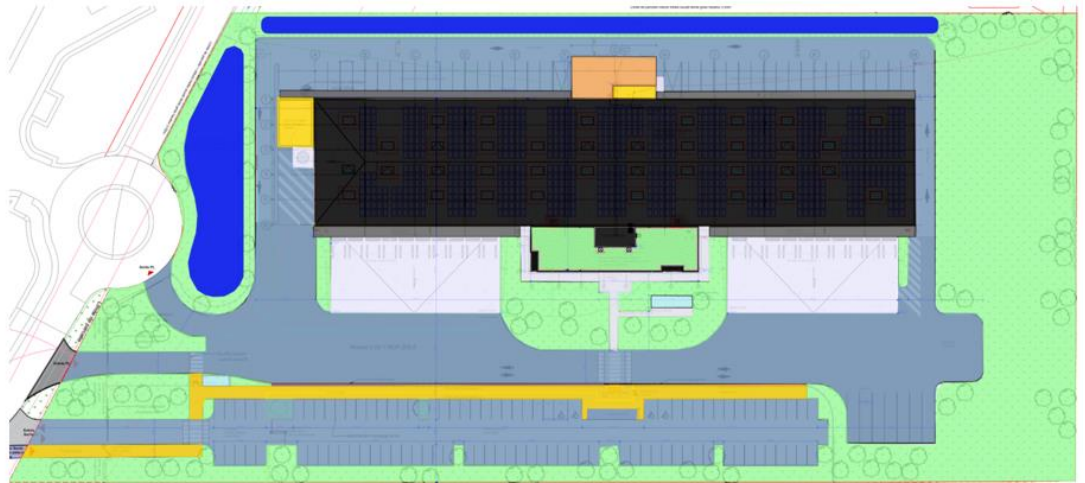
HORIZONTAL SURFACE DIVISION OF THE PROJECT (SOURCE: PAYET)
